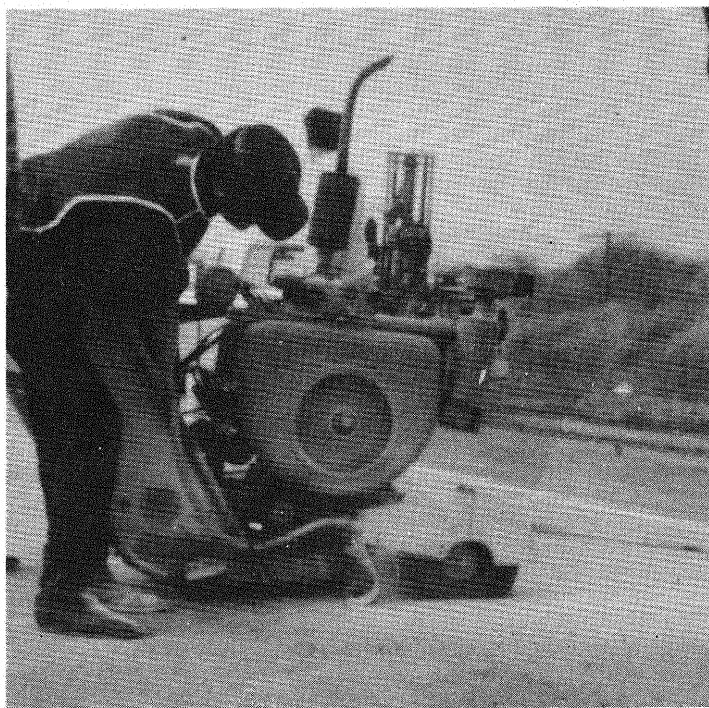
Workman Using Pavement Saw to Cut a Channel in PCC Pavement
